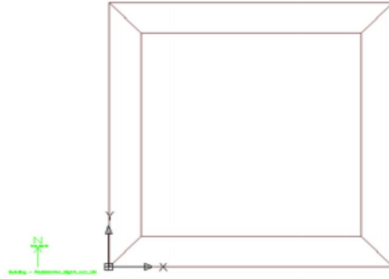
Top view of the Cool roof and Green roof model. Source : (Garg et al. 2016)
